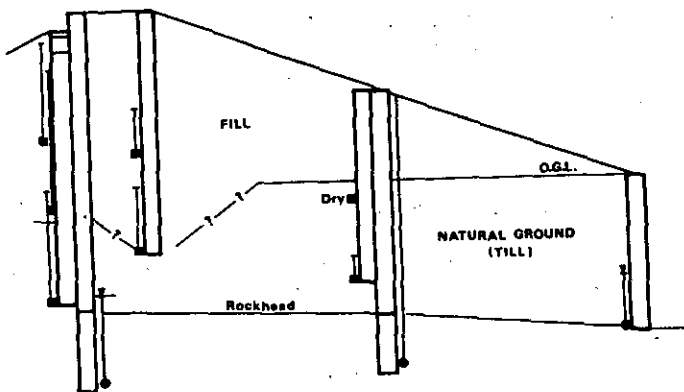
No.2 EMBANKMENT CROSS-SECTION
